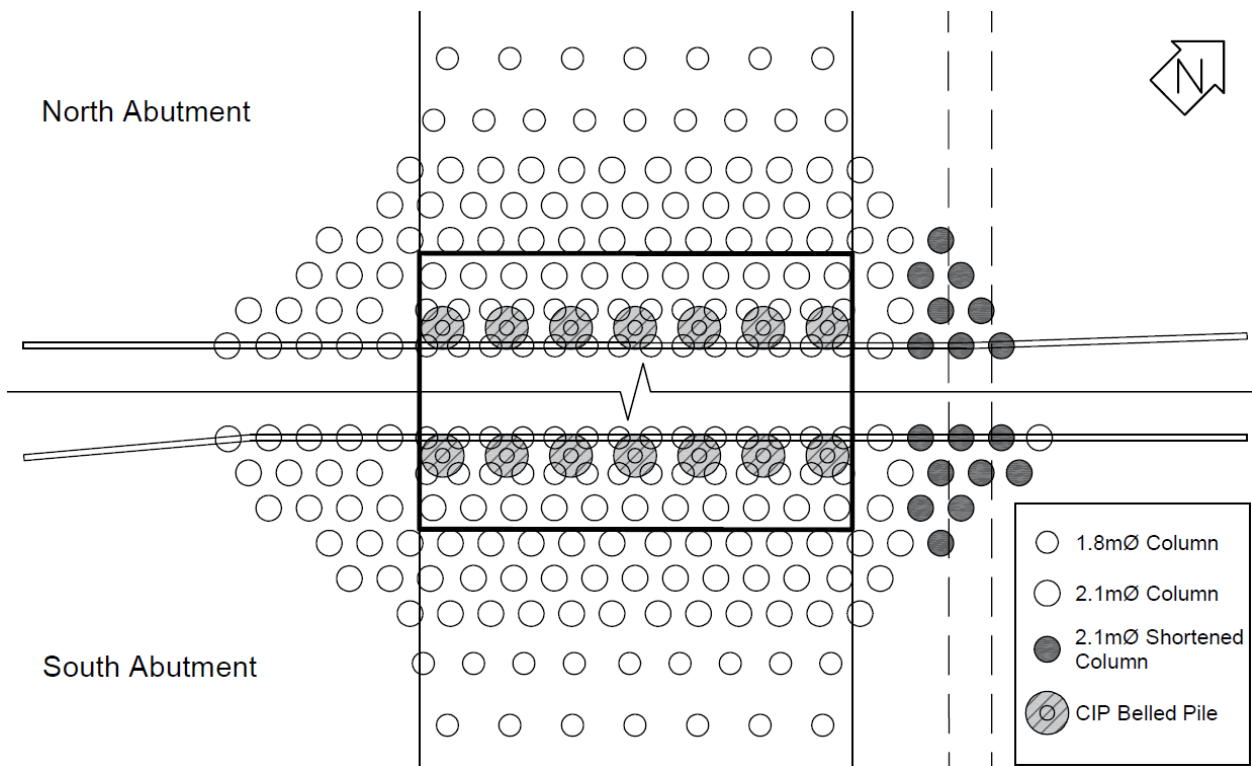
Foundation Design Layout (TREK Geotechnical Inc., 2017)
